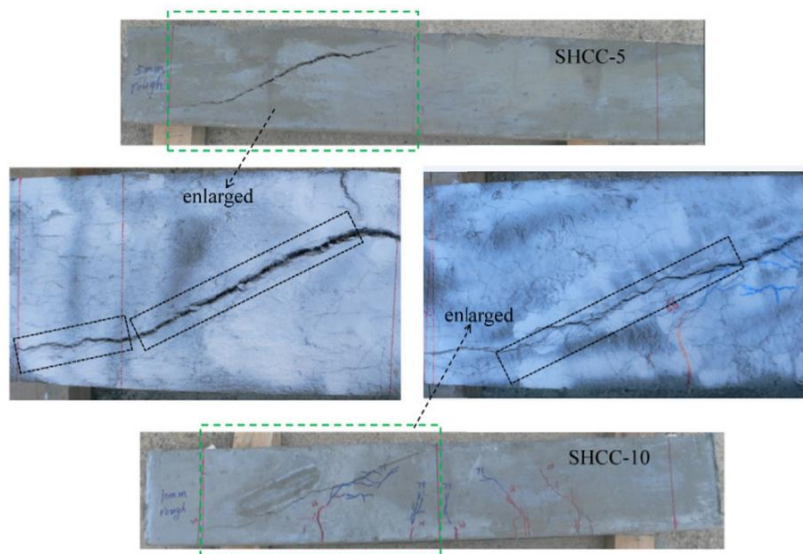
Cracking behaviour of SHCC-5 and SHCC-10 [7].
